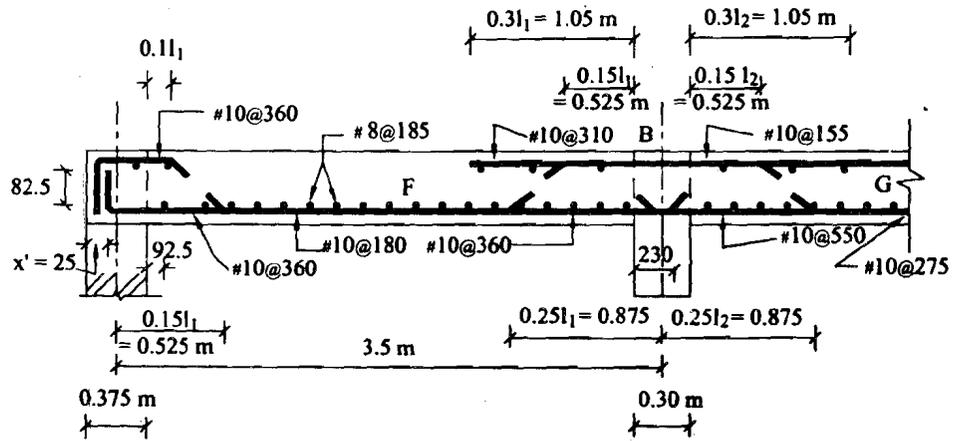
Reinforcement Details of One Way Continuous Slab
